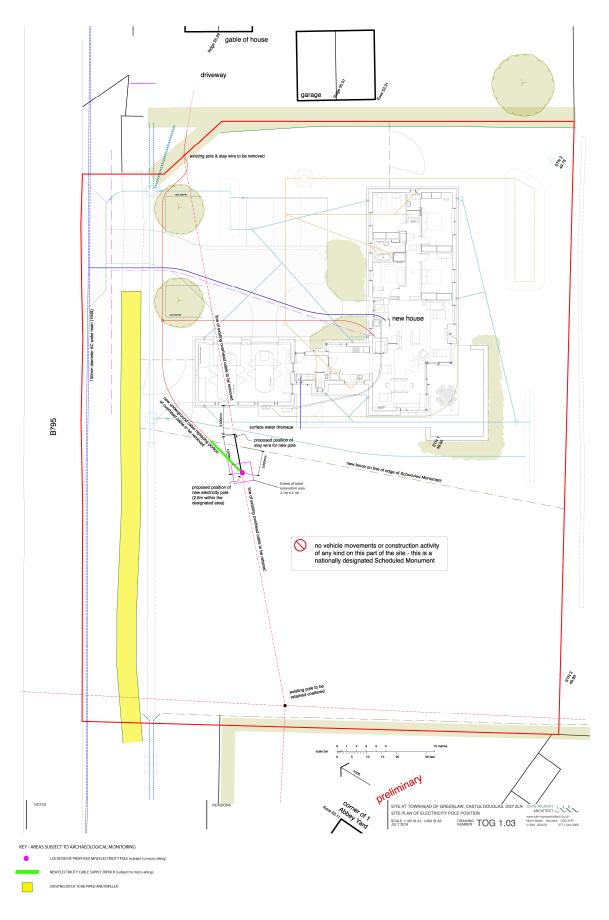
site plan showing proposed dwelling; location of new pole; route of underground electricity cable and location of existing ditch at the road frontage © John Murray Architect
